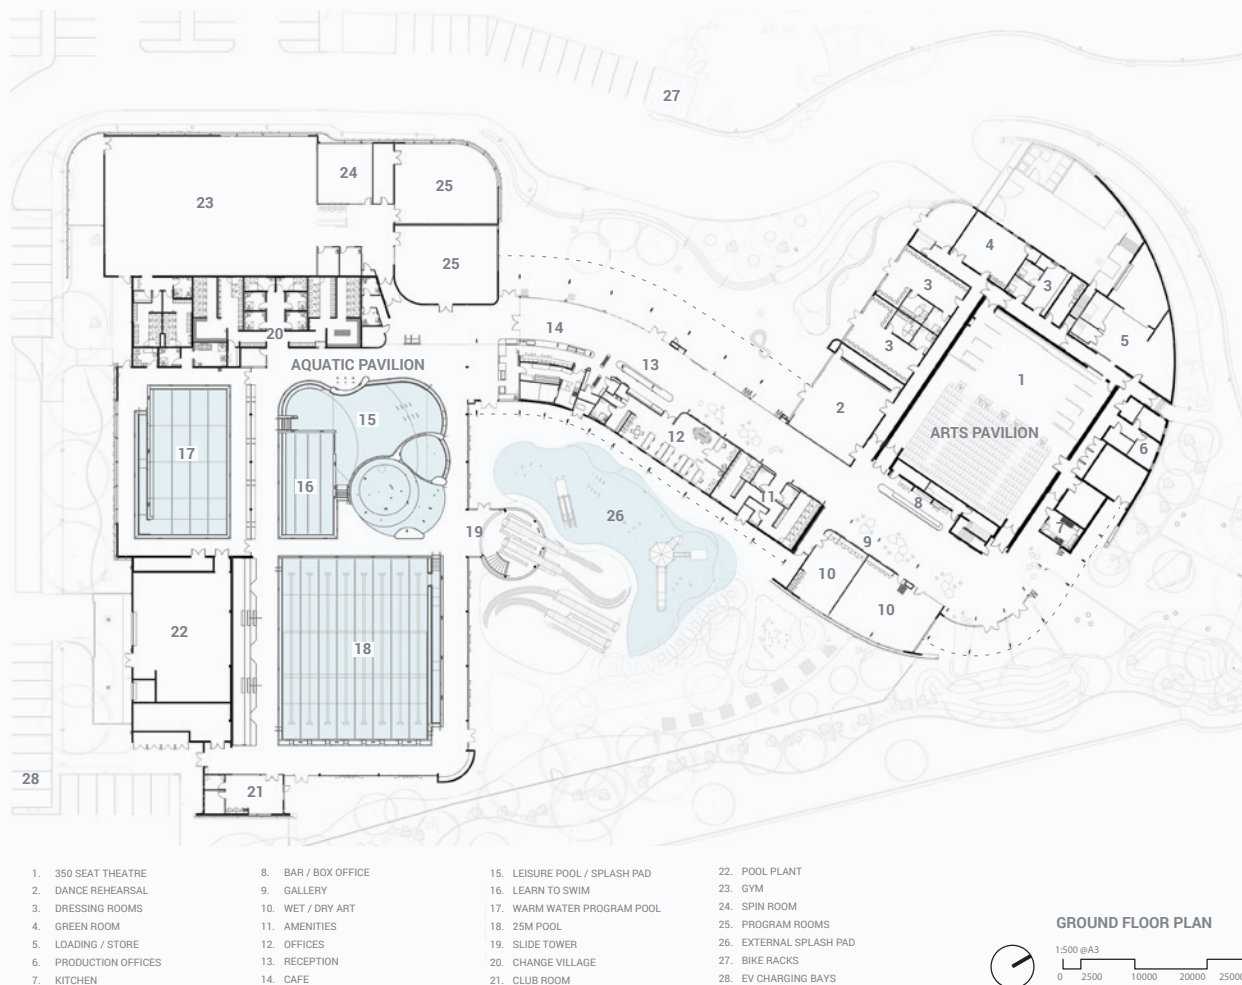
Ground floor plan (Drawing: NBRS + Donovan Payne Architects)
